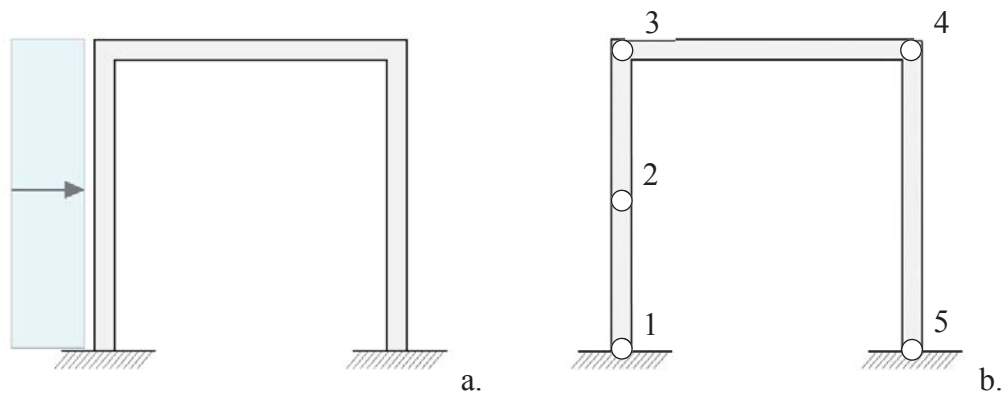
Concrete frame structure subjected to blast loading (a) and locations and labeling of plastic hinges (b).
